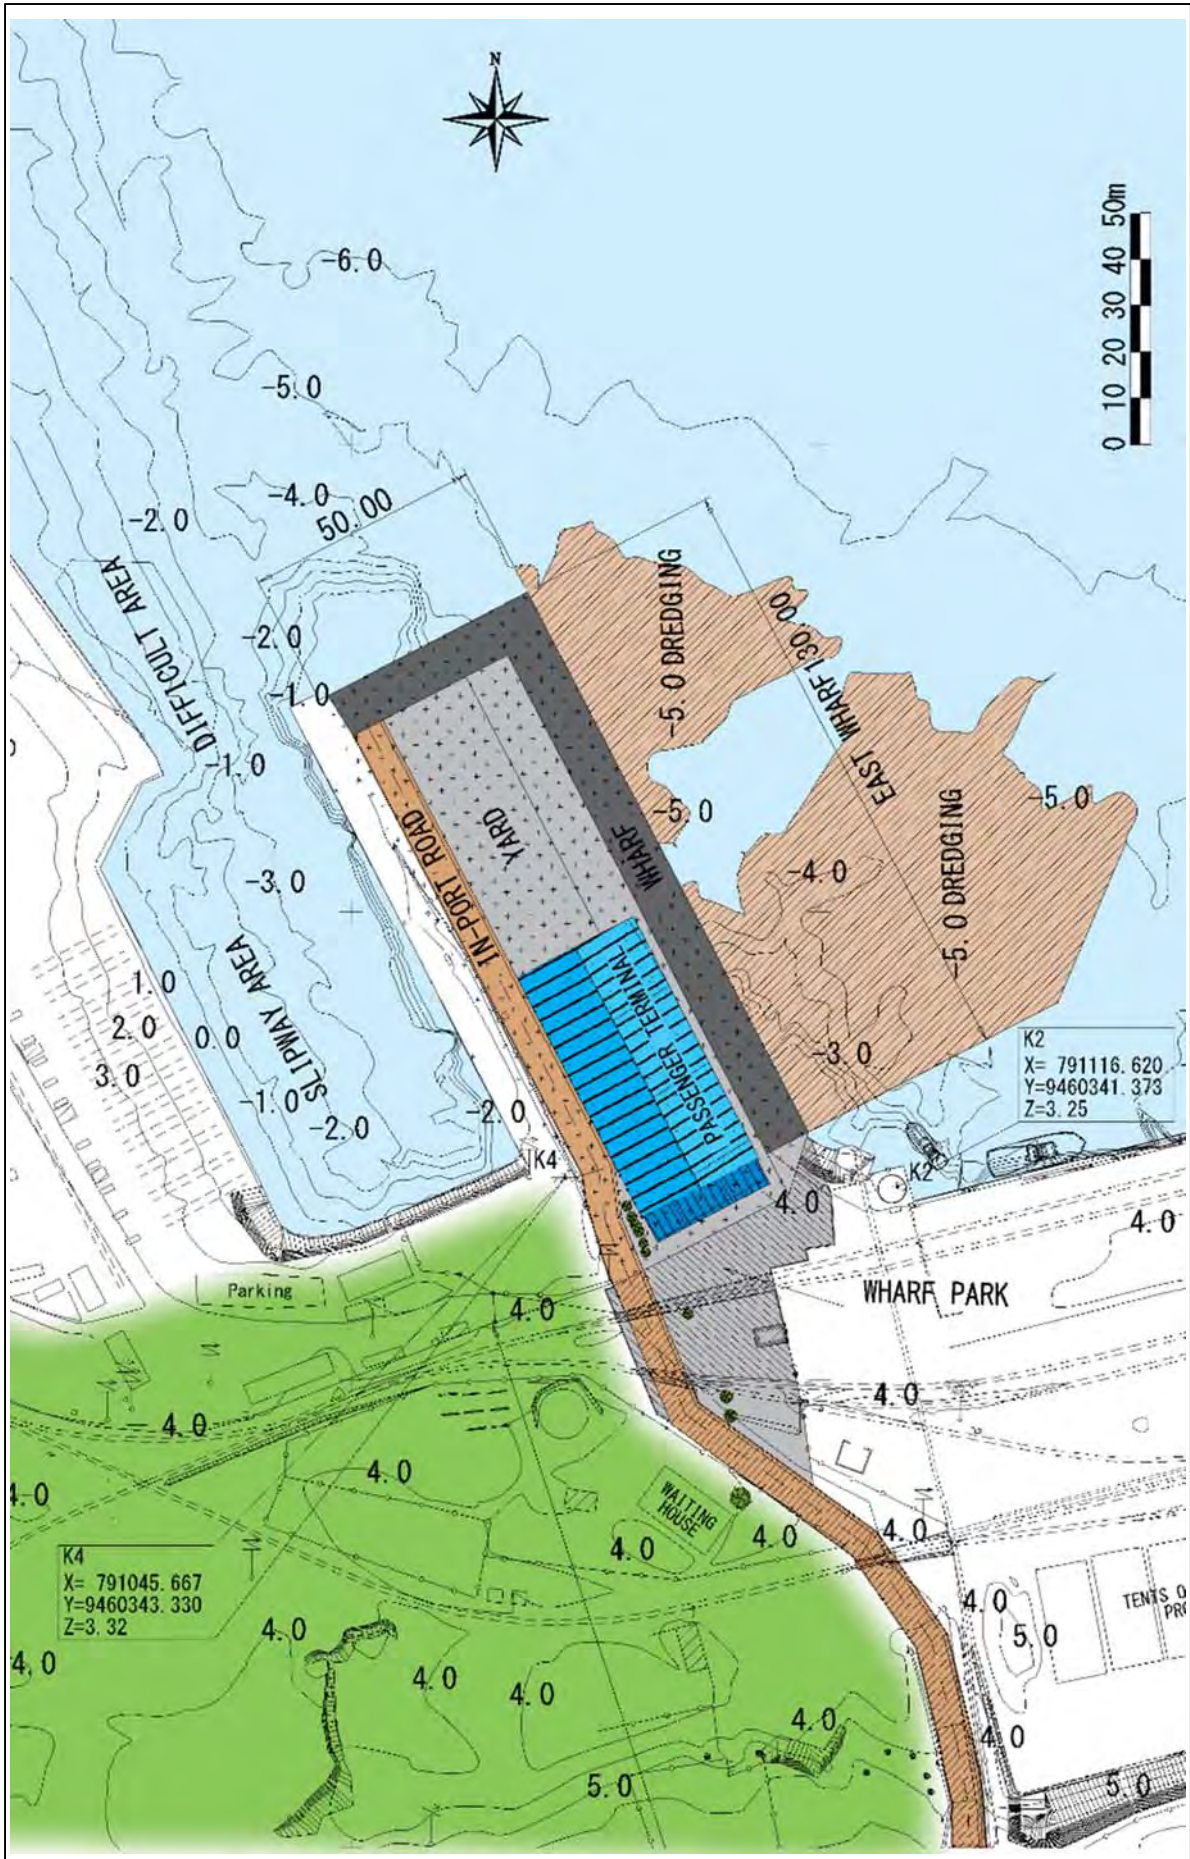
General Layout Plan of Passenger Terminal
